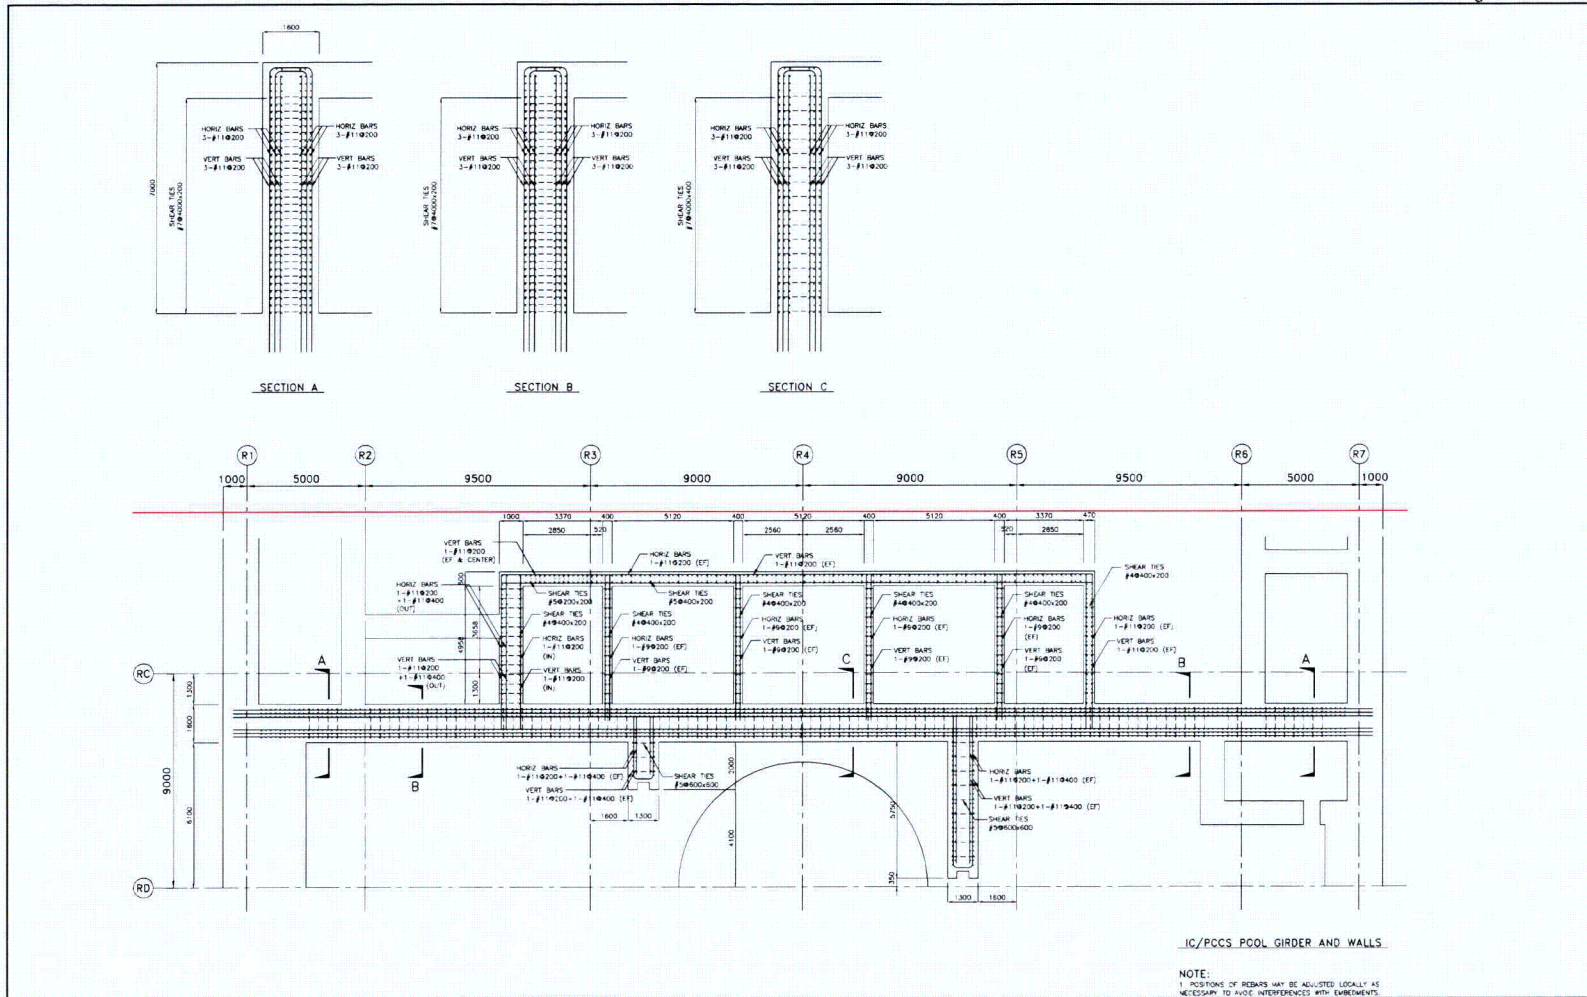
G.1-46. Reinforcing Steel of IC/PCCS Pool Girder
